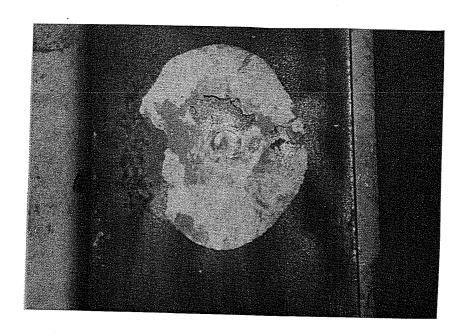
Failure of epoxy at both concrete and steel surfaces - Test Me3t
